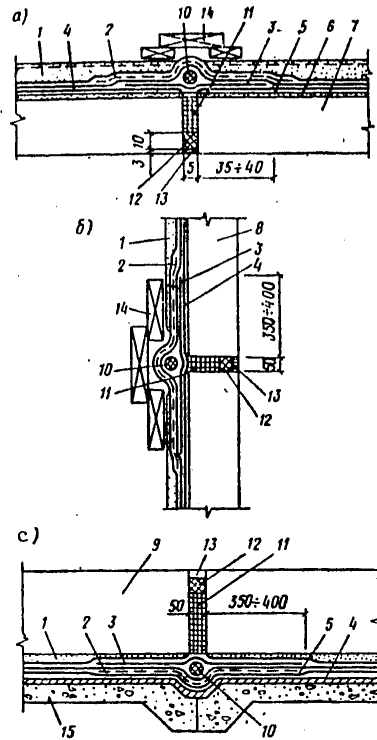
Structural decision for deformation joint in components of shelters of monolithic reinforced concrete
